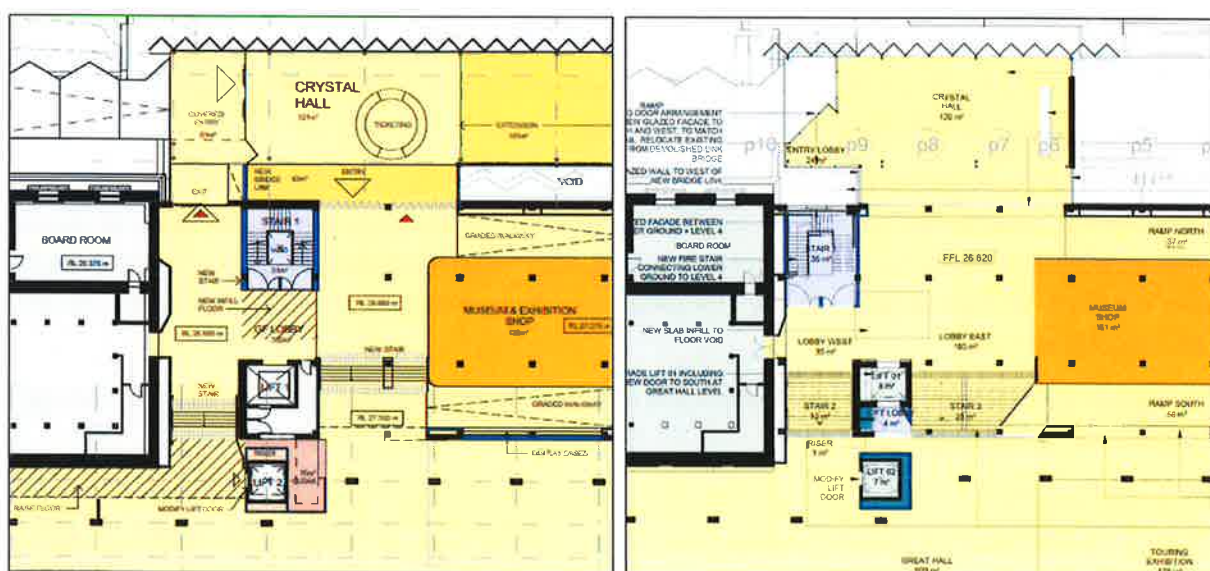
| Ground floor plan showing originally proposed and amended proposal (Source: Applicant's RTS).
